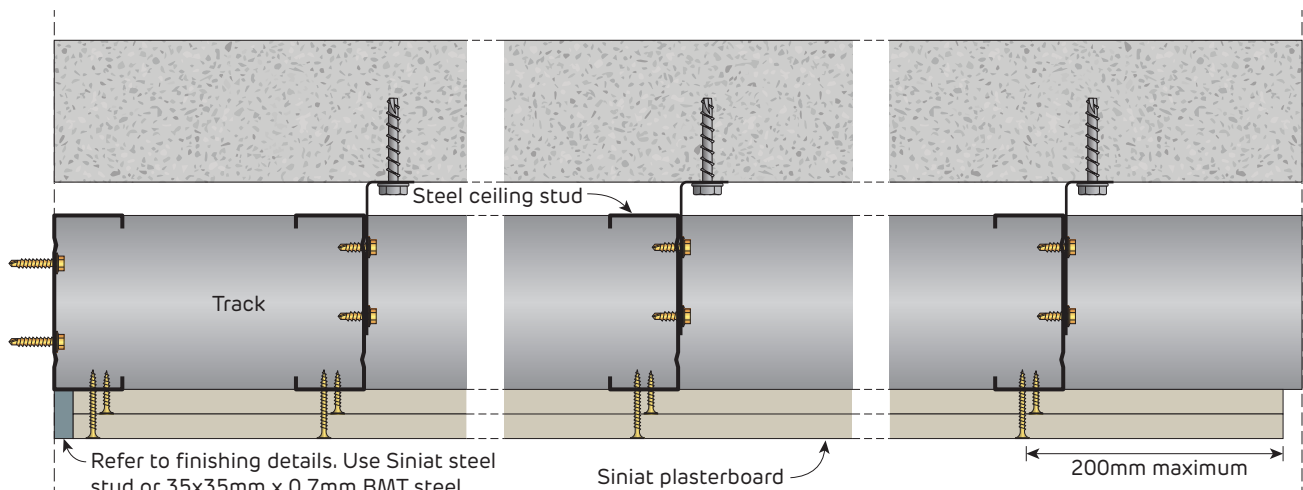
Stud Ceiling Type A4 - Fixed / Sliding
